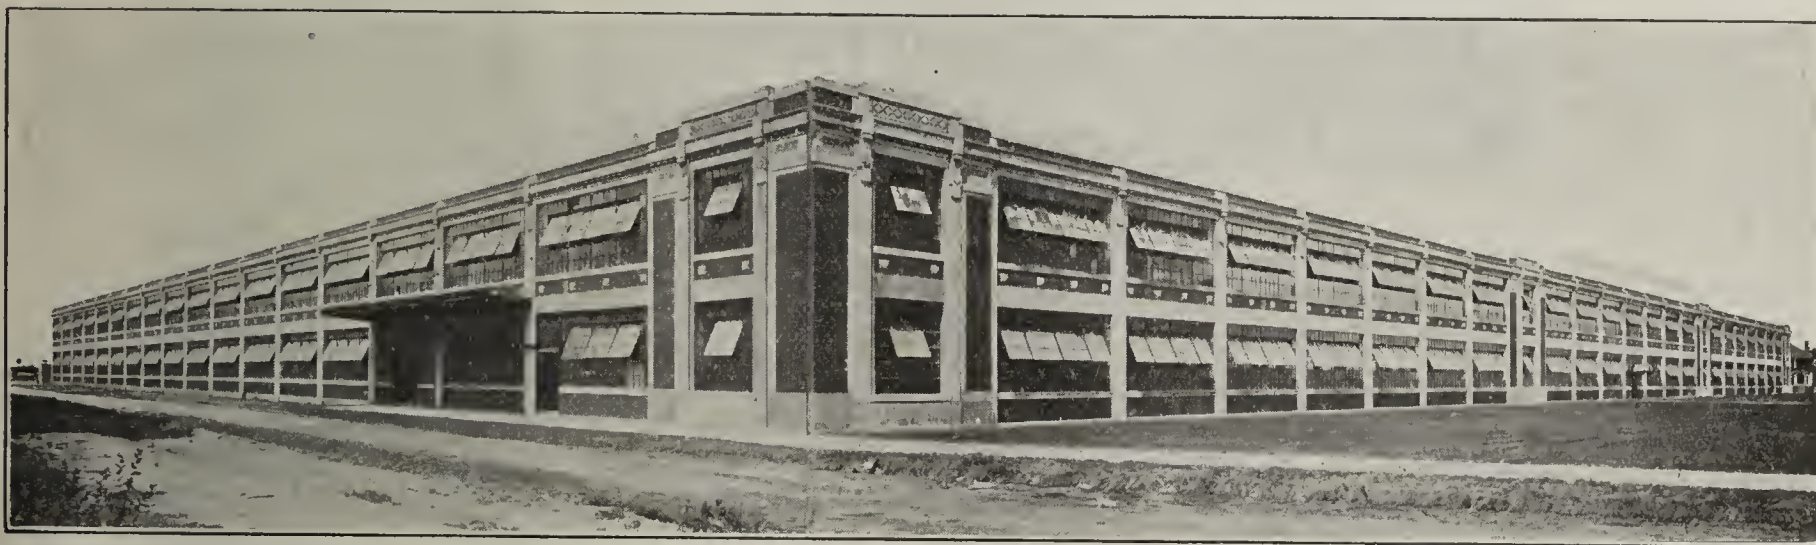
A Reinforced Concrete Factory, Showing the Architectural Beauty Worked Out With Ordinary Concrete and Pressed Brick.
